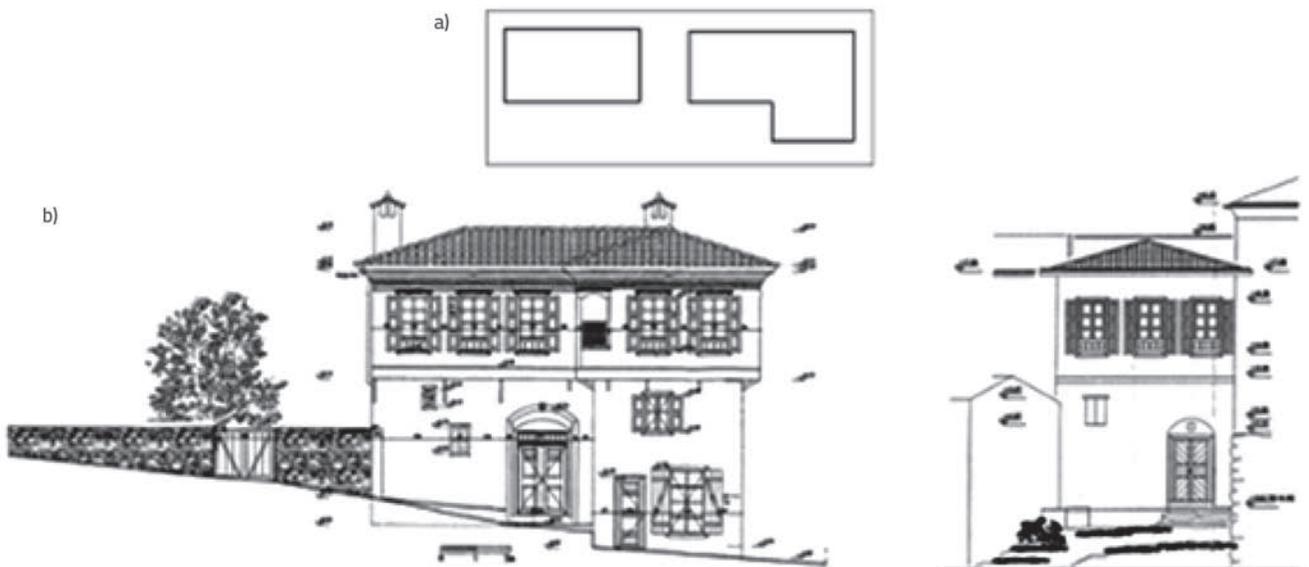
Traditional Şirince Houses: a) Plan types; b) typical façade characteristics (August 2013)
